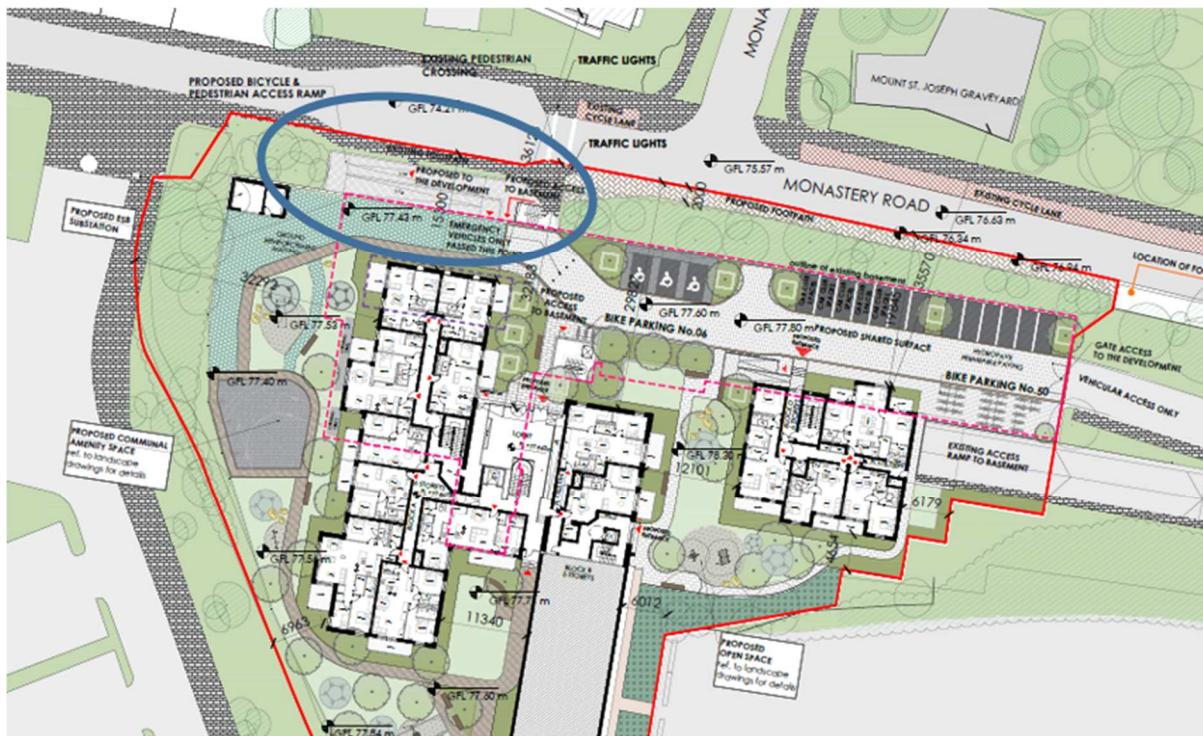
Location of pedestrian access at northern end of site adjoining Monastery Road
